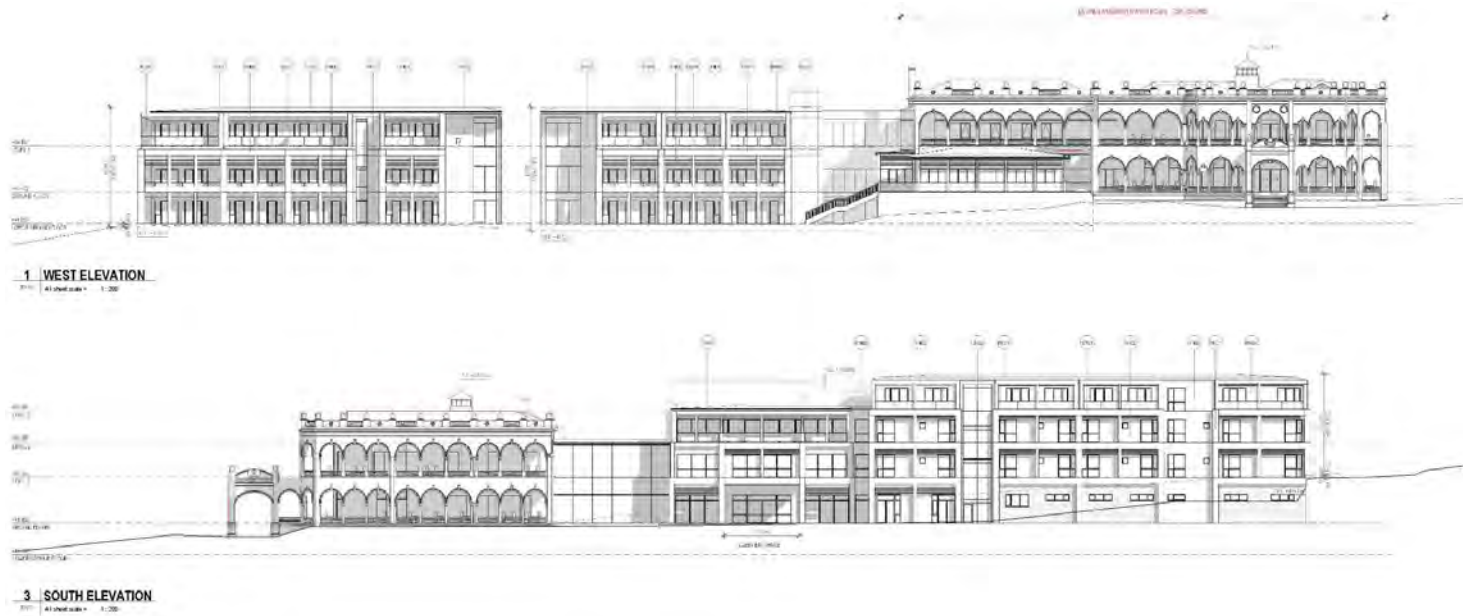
West and South elevations (Source: Ryman Healthcare).
